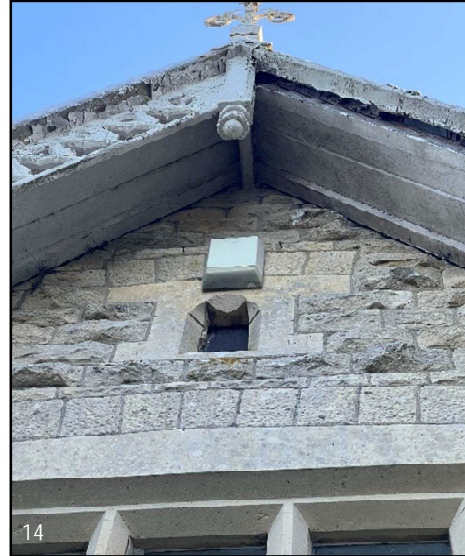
Gaps at the wall top on the northern gable wall (Bat Note 9).
